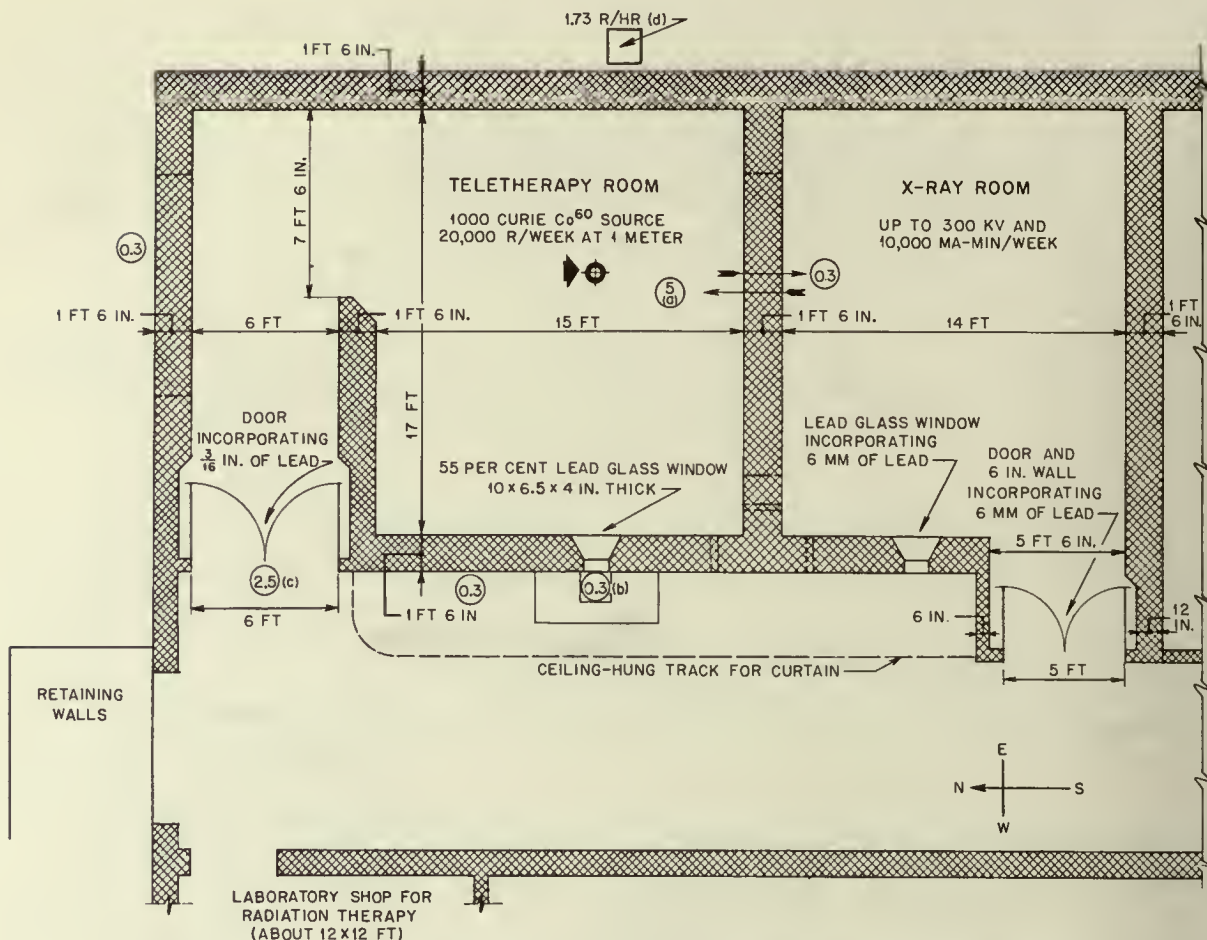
Tentative plan for radiotherapy rooms at the Syracuse Memorial Hospital. The assumed density of concrete for all walls and roof is 2.35 g/cm^3 (147 lb/cu ft). The roof will be 18 in. thick and will be reinforced to support 70 lb/sq ft in addition to the maximum load otherwise considered. There are to be special conduits and provisions for conjoint use of the teletherapy and the X-ray rooms. The ceiling height will be 11 ft.
